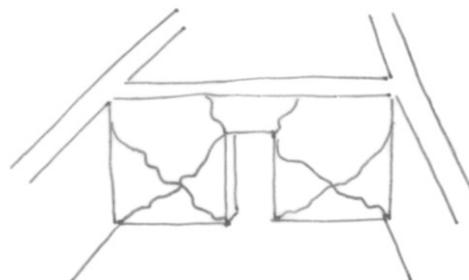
X-shaped cracks in a partition wall
